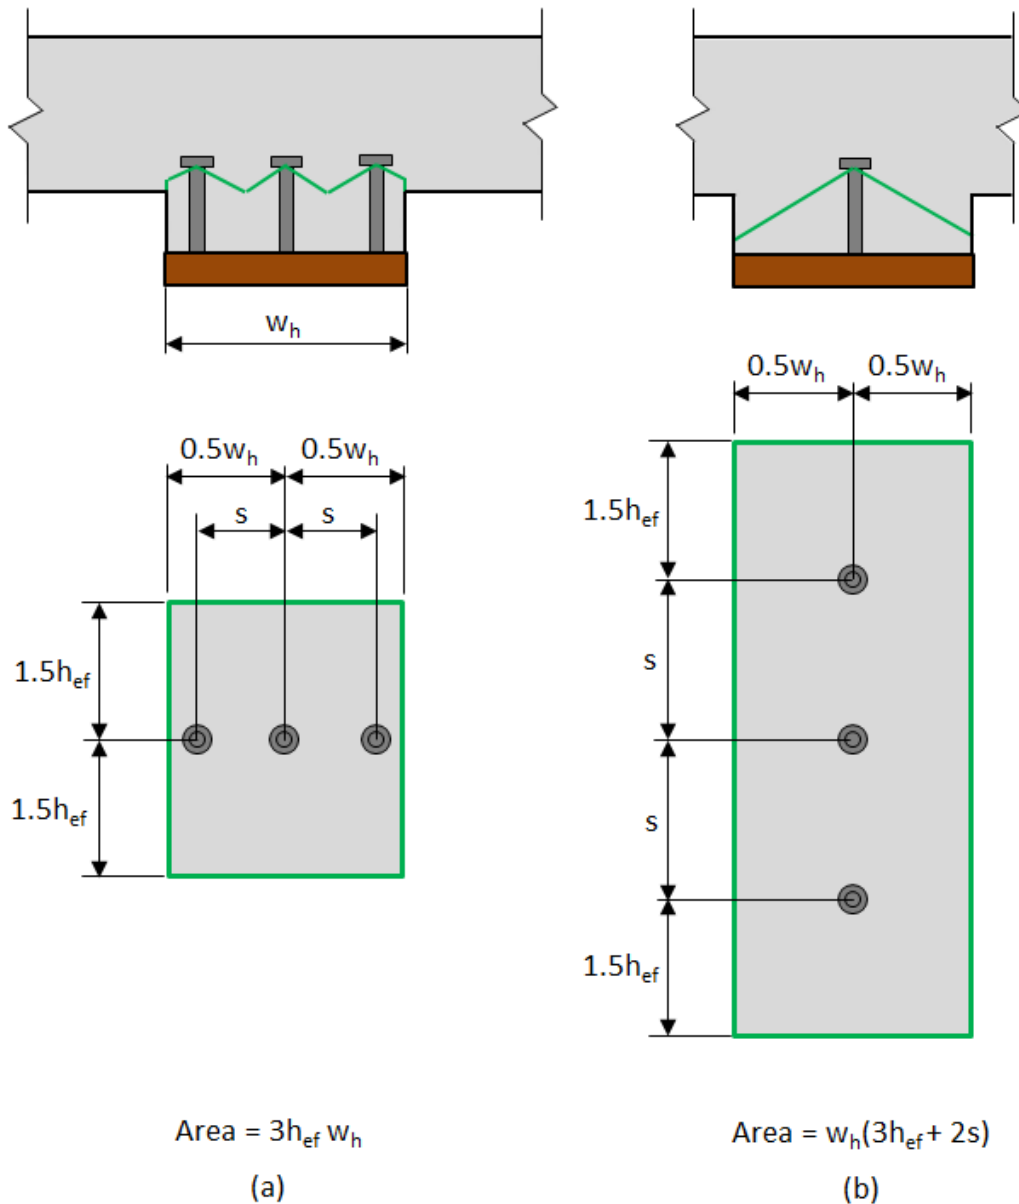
Dimensioned Projected Concrete Cone Failure Areas for (a) 3 Studs spaced Transversely and (b) 3 Studs Spaced Longitudinally, both in a Haunch
